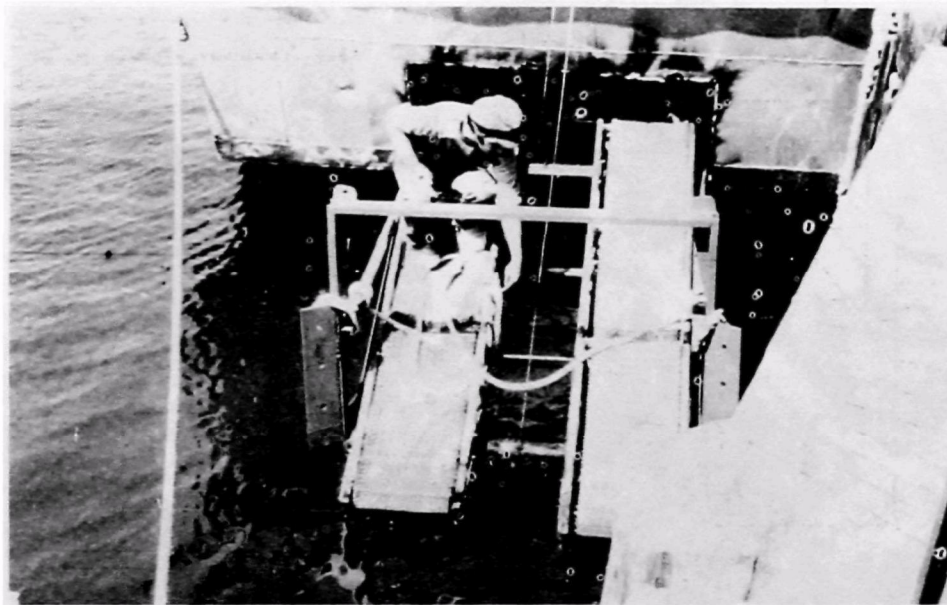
Installation of Wing Support Structure and Conveyor Belts
